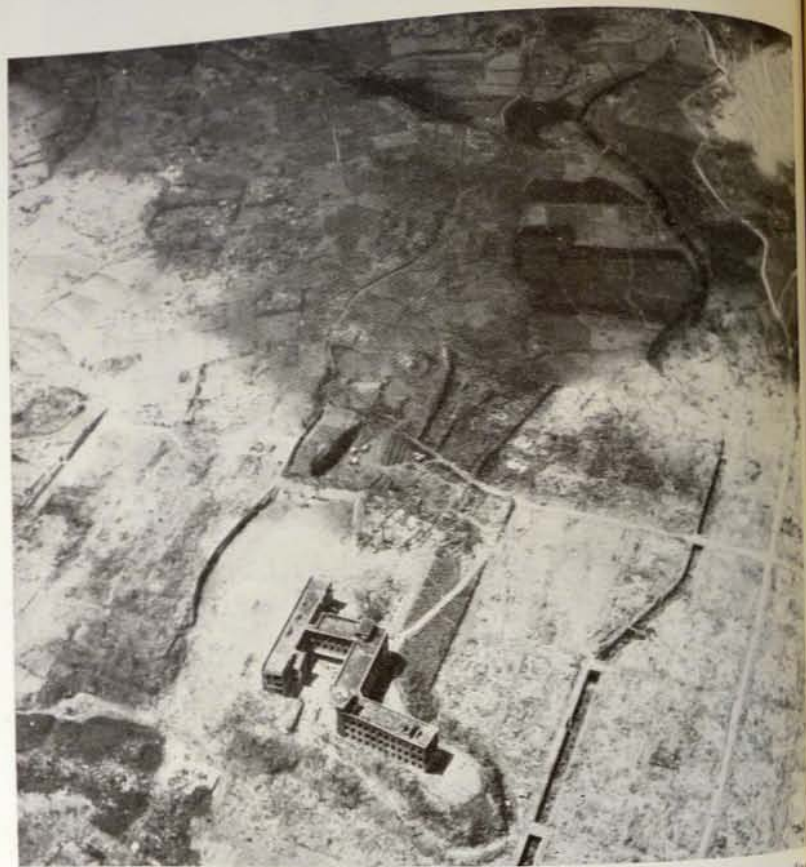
1,600 feet from GZ. Group 16 photo taken 3 September 1945 showing east end of Building 2 still standing. The end of this building collapsed at a later date.
